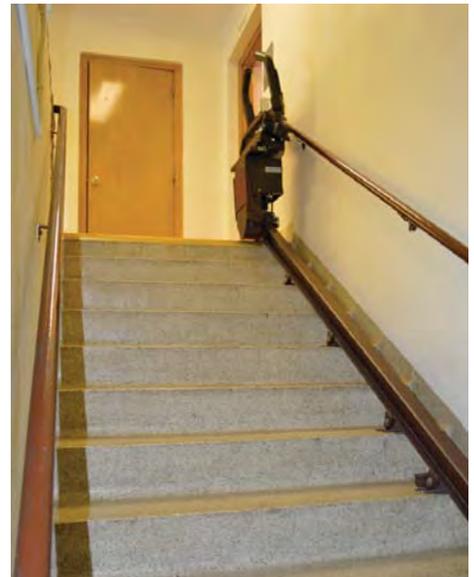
Staircase, Foyer to Basement Rec. Room
